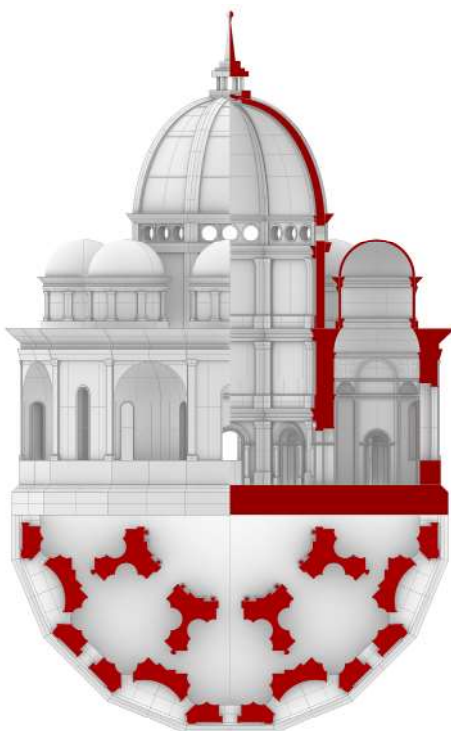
Plan, section and elevation (1:500) of the solution derived from plan.
